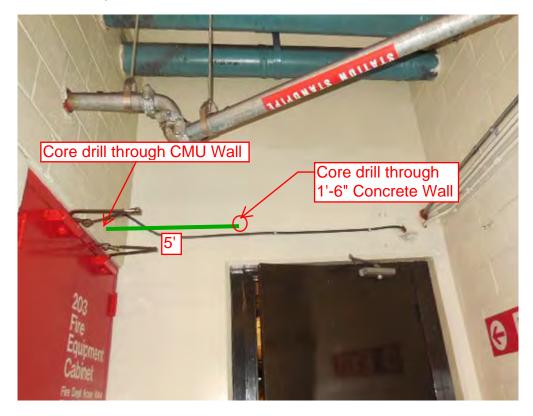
Proposed Conduit Run between Room 201 and Room 203
